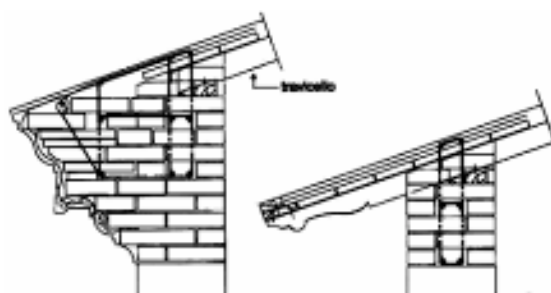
Reinforced masonry bond beam, (Gurrieri, 1999).
